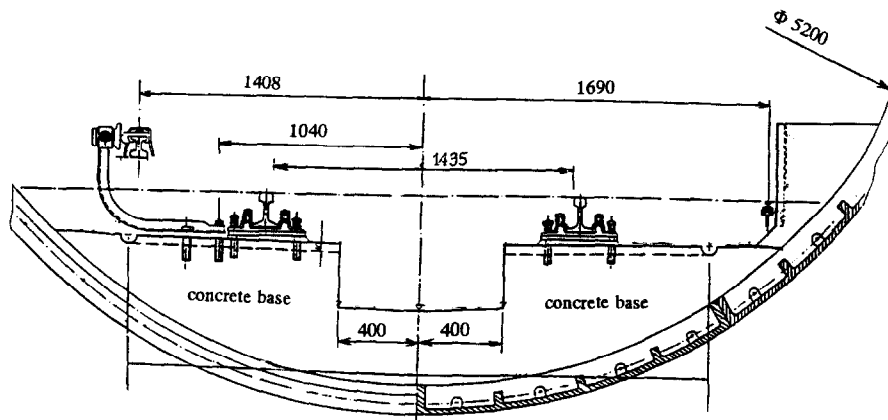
Lower part of the tunnel cross-section with the concrete base.
